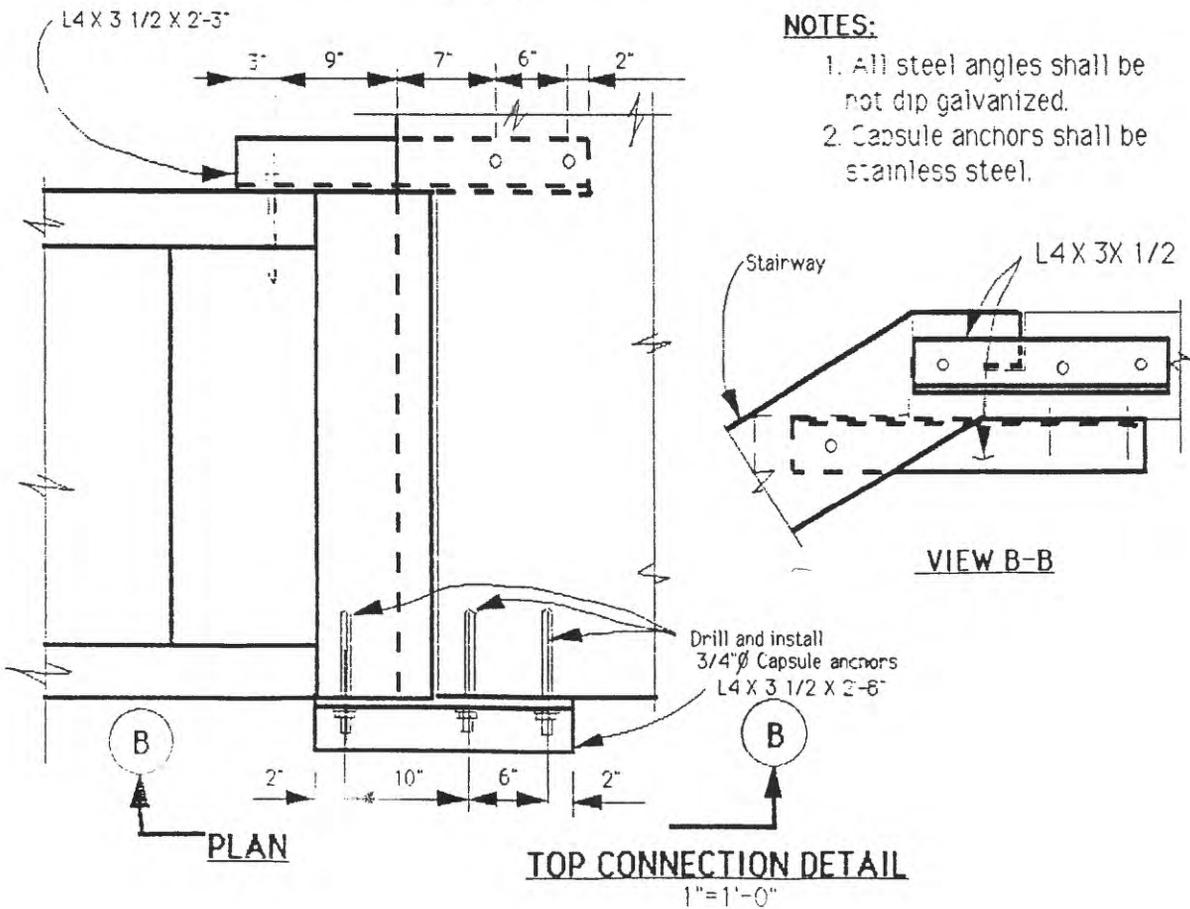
Plan for stairway repair of San Mateo-Hayward Bridge (White, 1990).
